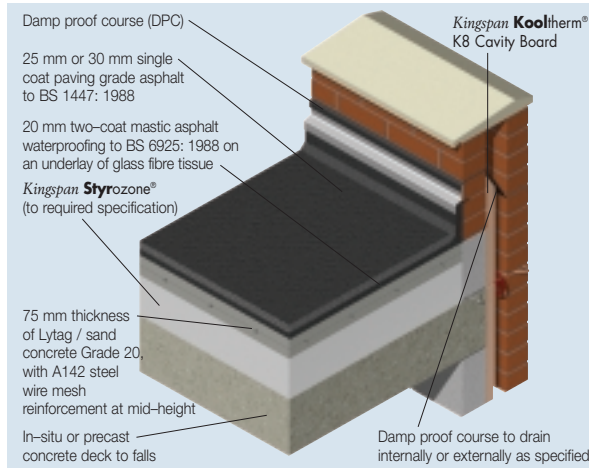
Concrete Slab Finish Parking Decks, Cars and Light Commercial Vehicles (Non HGV) (Maximum Individual Wheel Load – 1 Tonne)
